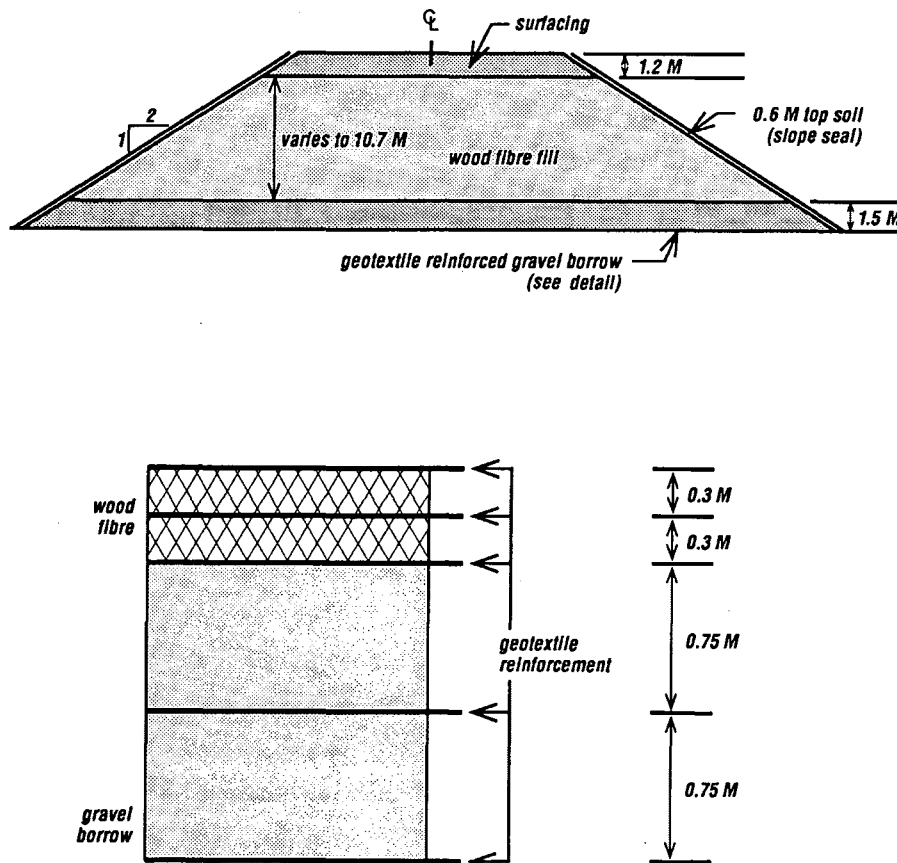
Design cross section for reinforced wood fiber fill: top, fill cross section; bottom, geotextile reinforcement detail.
